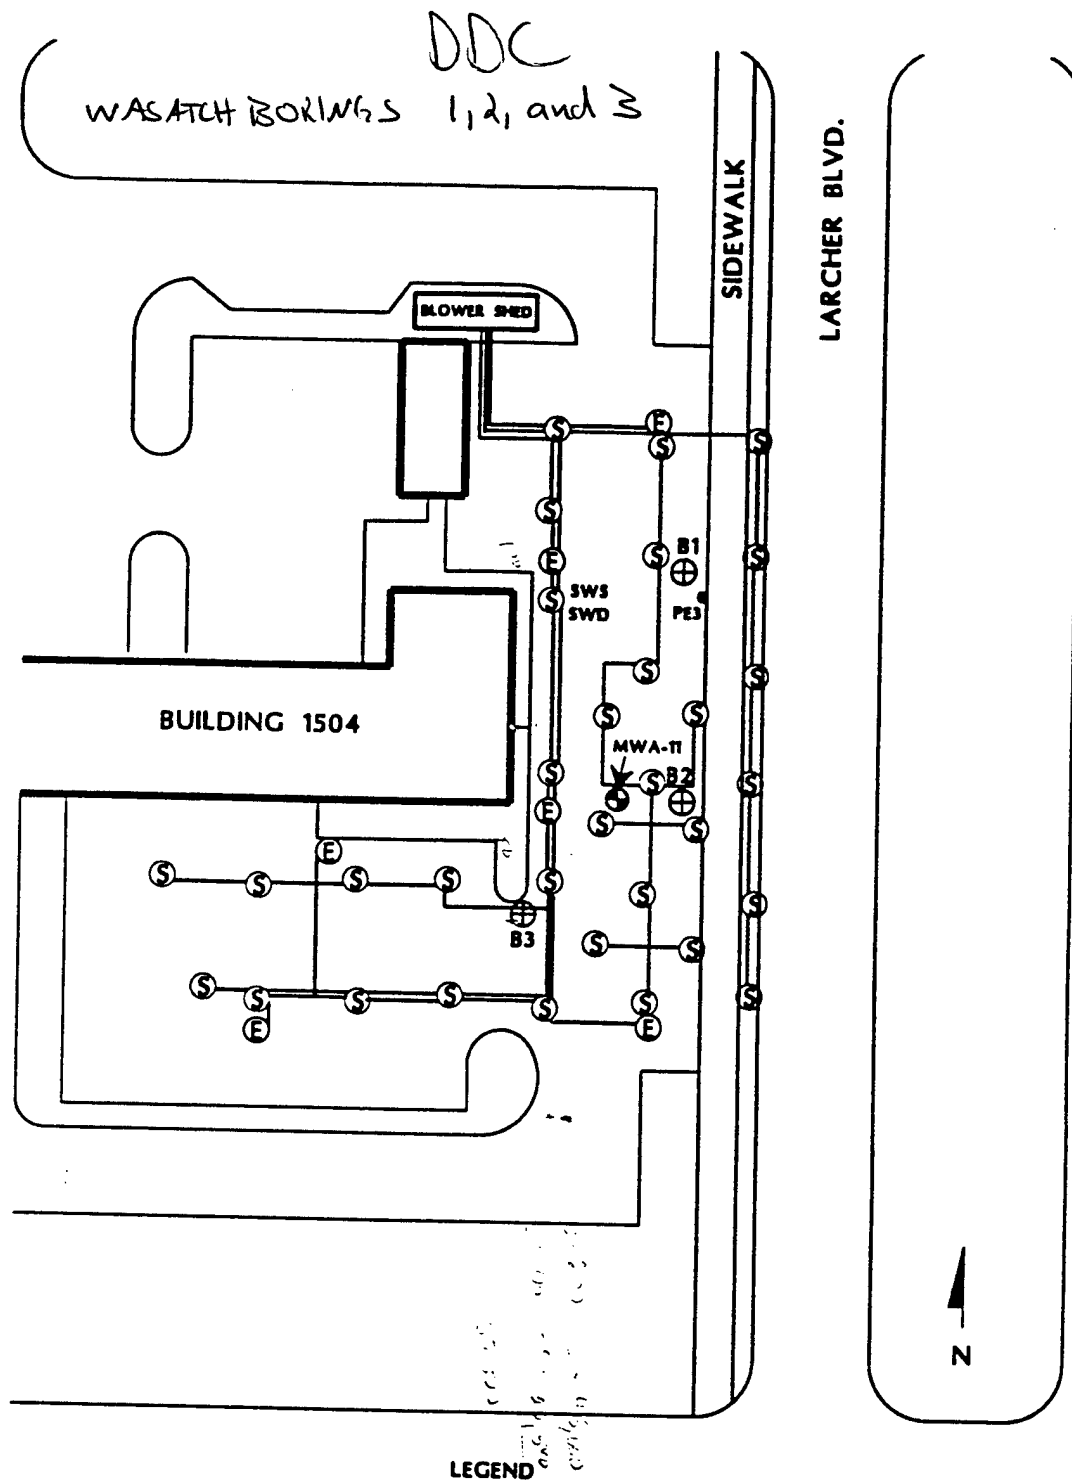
PLAN VIEW OF DDC AND SVE WELL LOCATIONS
